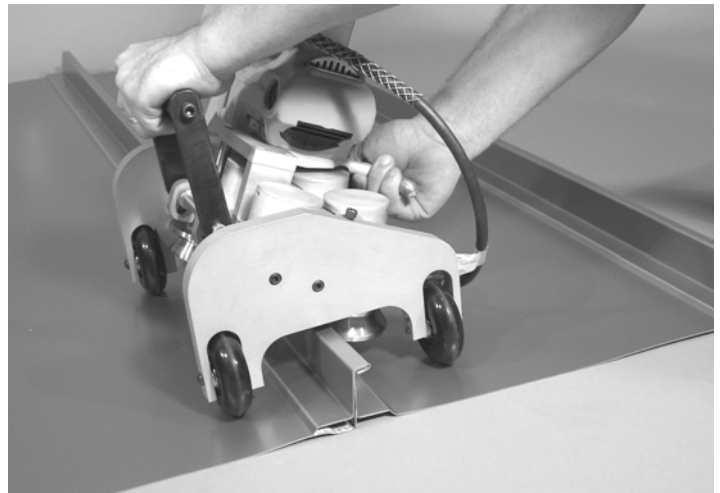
Open the Seamer Dies and position the seamer over the sidelap at the hand-crimped starting point.
